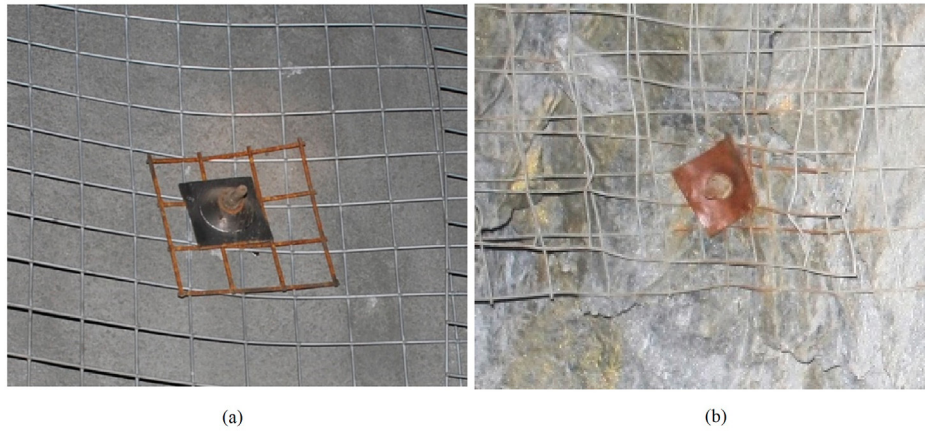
Use of dome-shaped plates to avoid mesh wire damage by plate edge-cutting: (a) a dome-shaped plate together with a strap pad underneath after installation, and (b) the deflection of the dome-shaped plate after subjected to heavy rock deformation.
